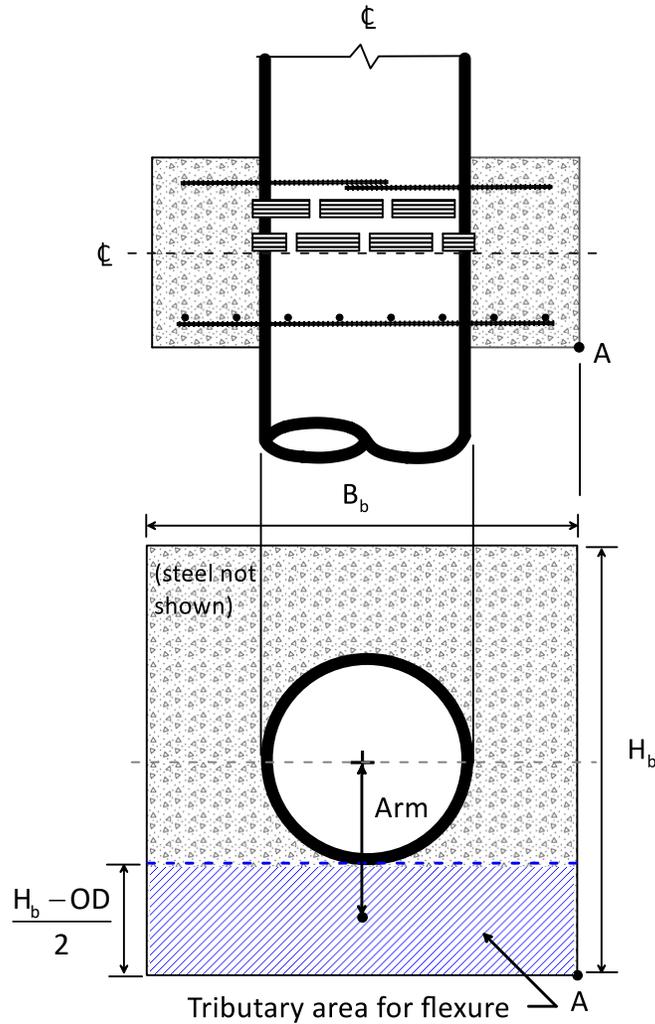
Moment at center of anchor block for 24 in. pipe example
